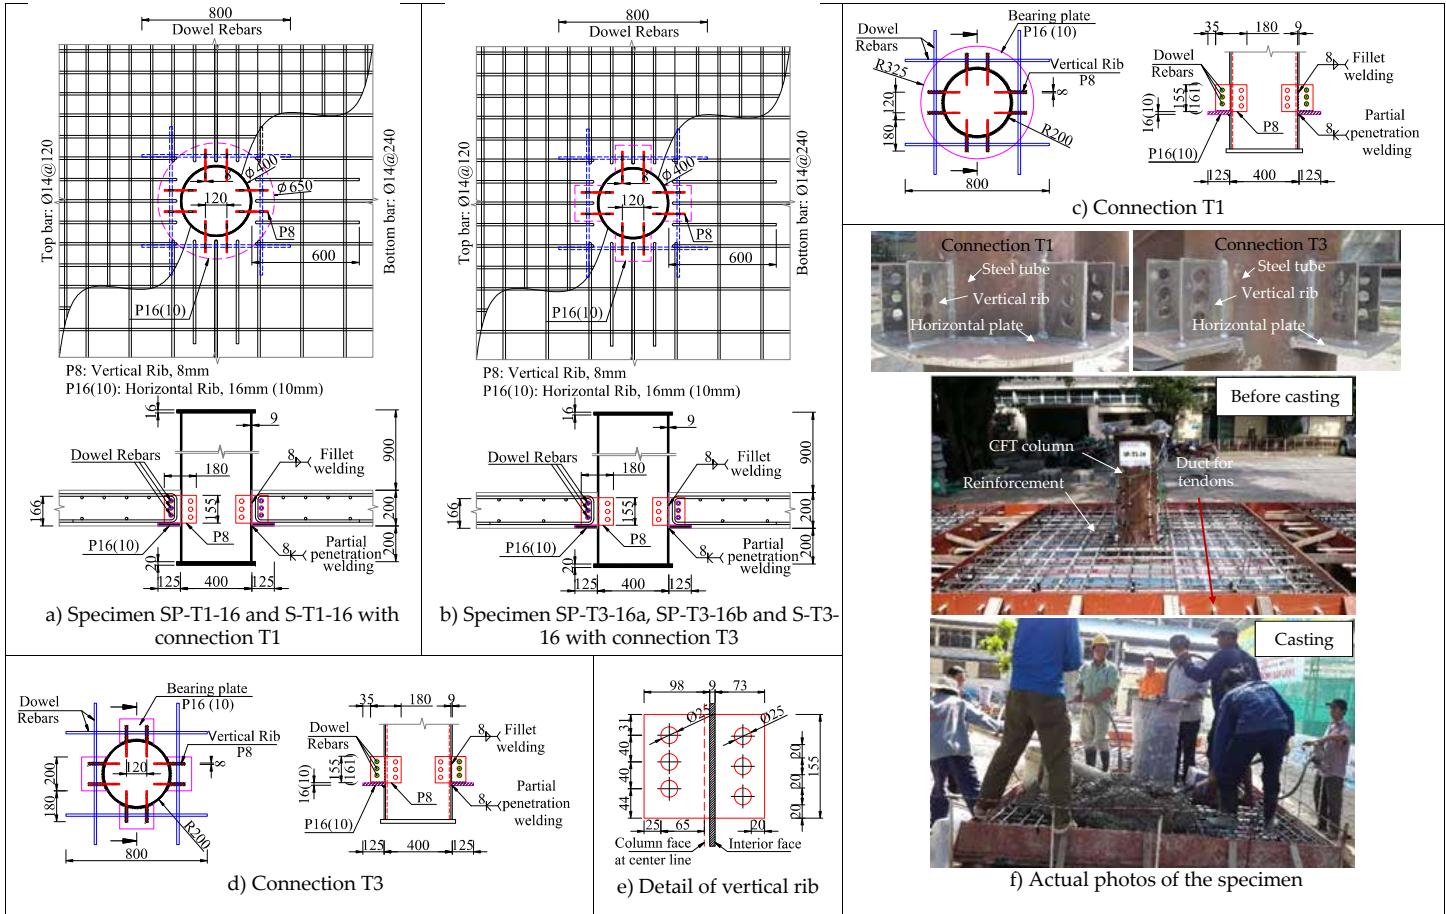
Flat slab-CFT column connection joint designs(Luu et al., 2022).
